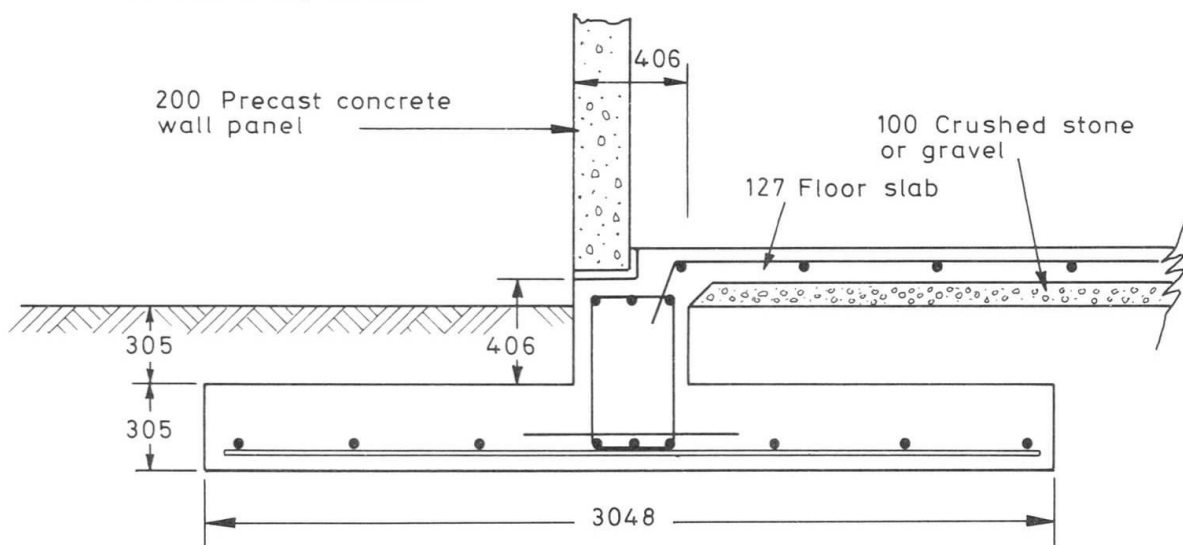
Shallow RC strip foundation for office building on reclaimed swampland at Foster City, California
